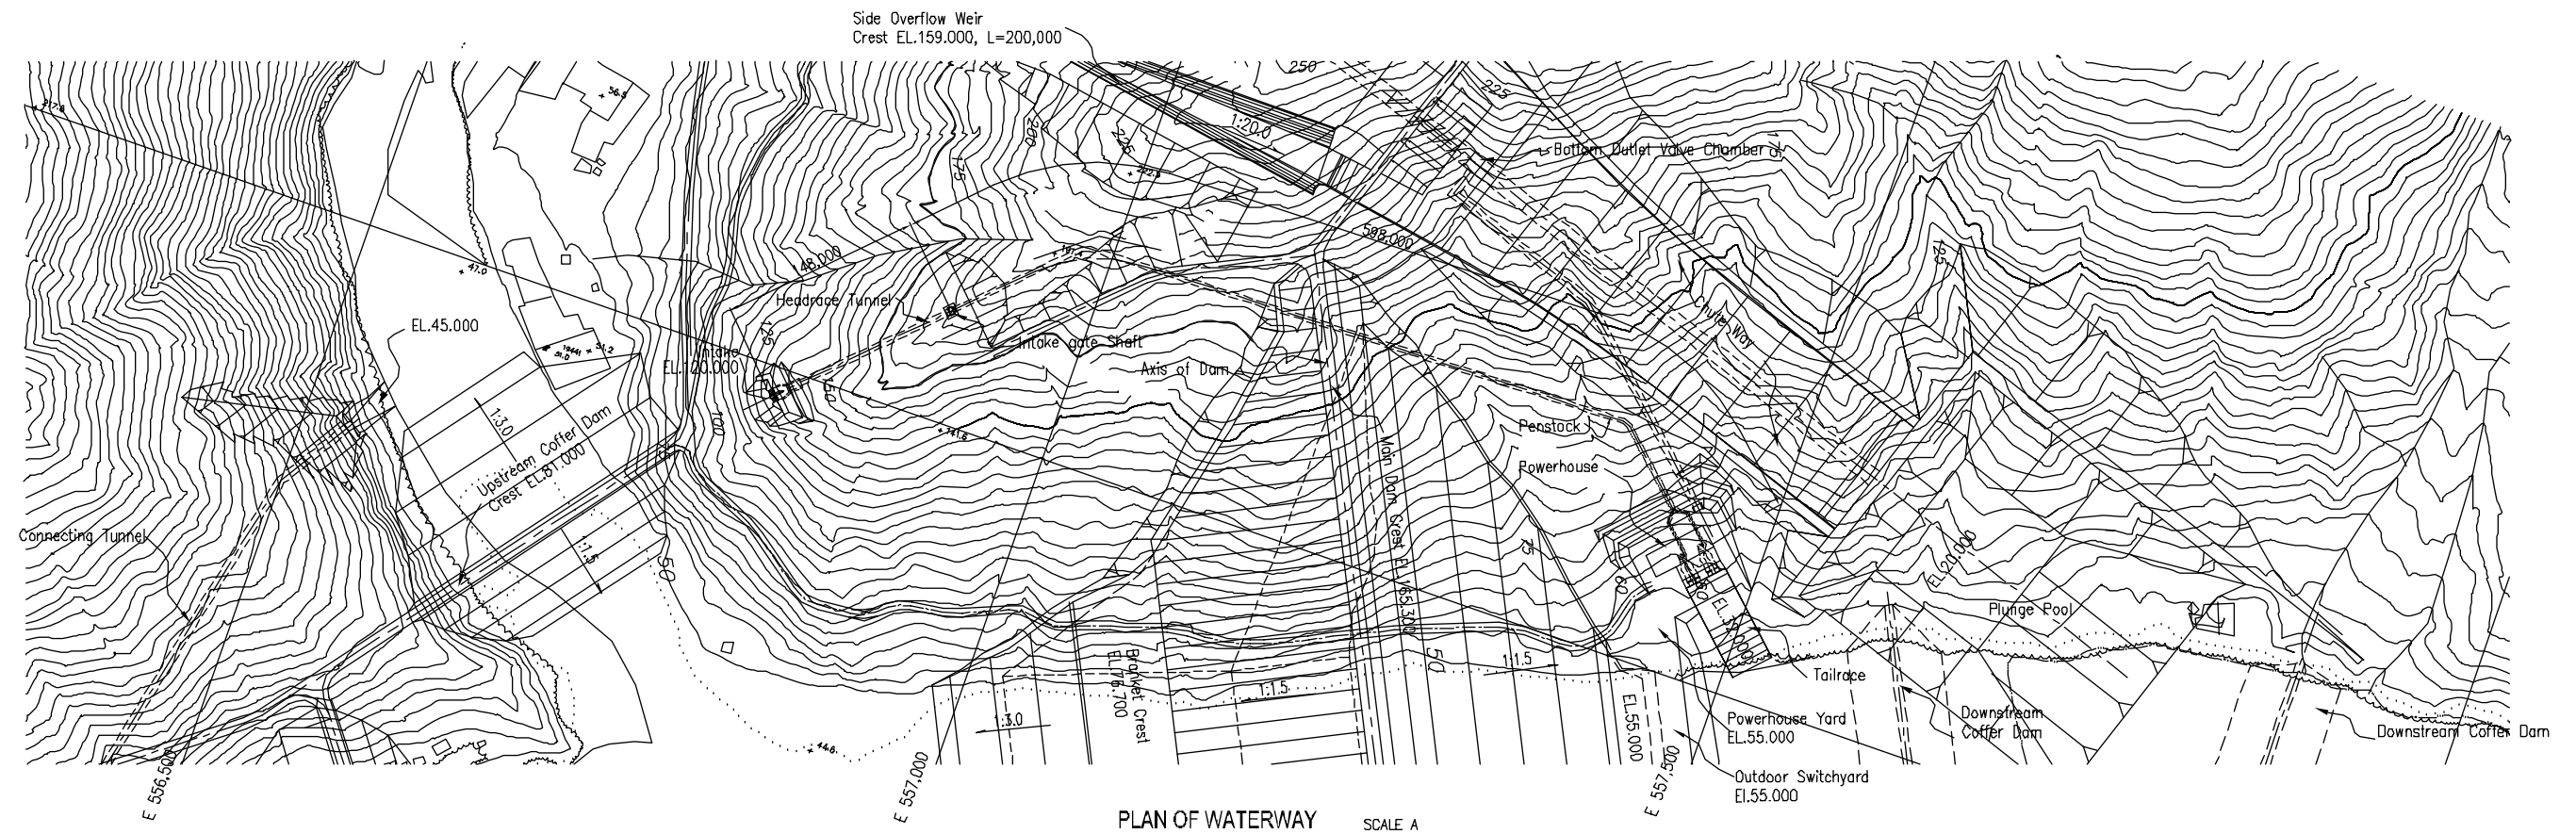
General Layout Plan and Profile of Agos Hydropower Scheme
